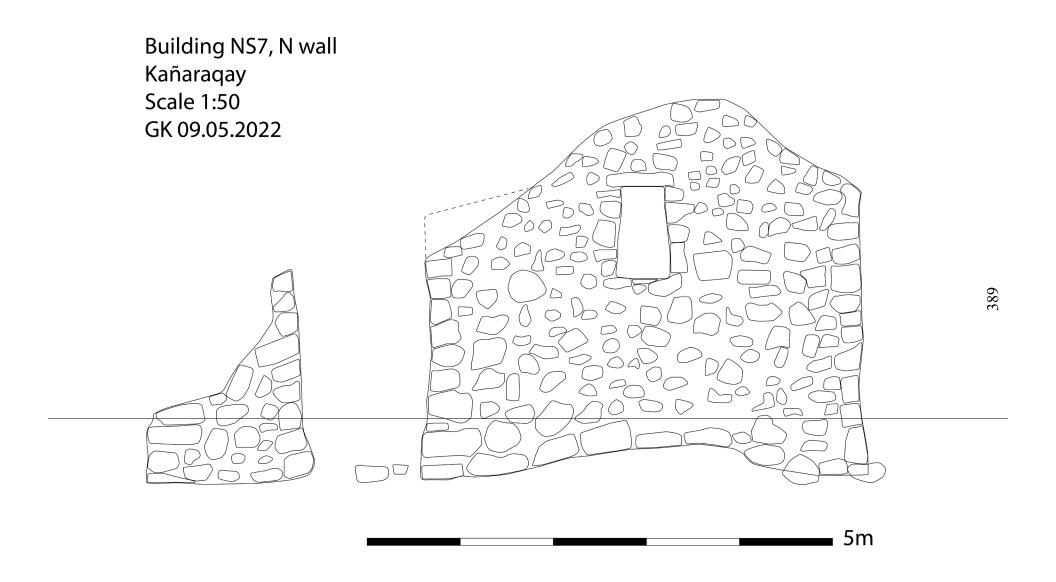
Outside elevation of the North wall of Building NS7, Kañaraqay
